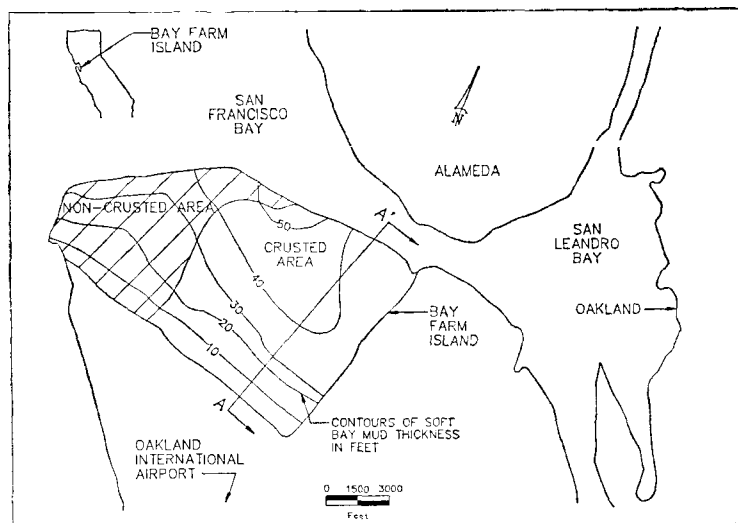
Site plan and contours of Bay Mud thickness at Bay Farm Island
